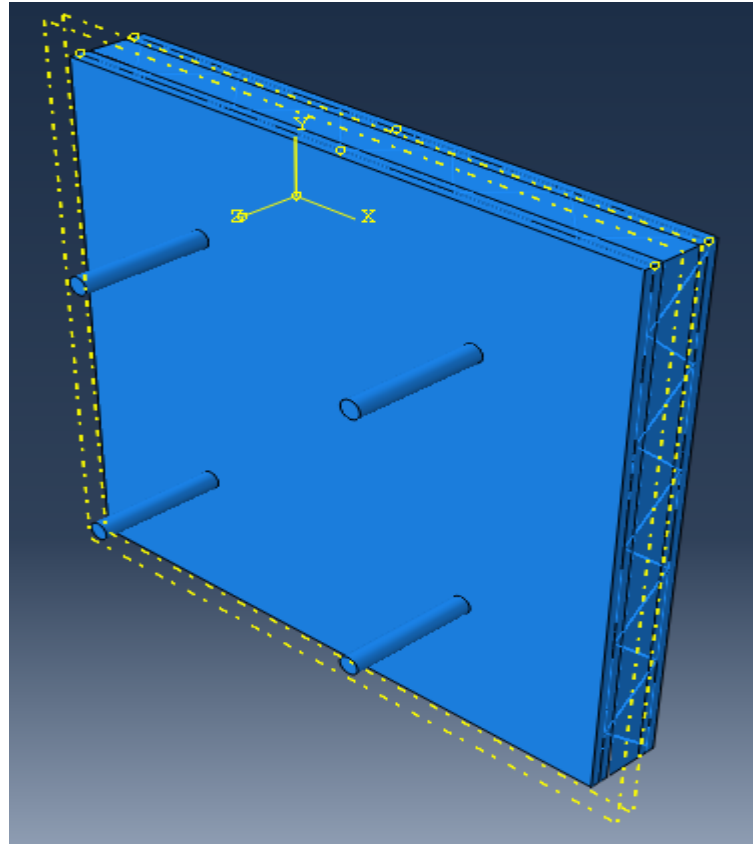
3D Welded Wire Panel with 4 Inch EPS Thickness
